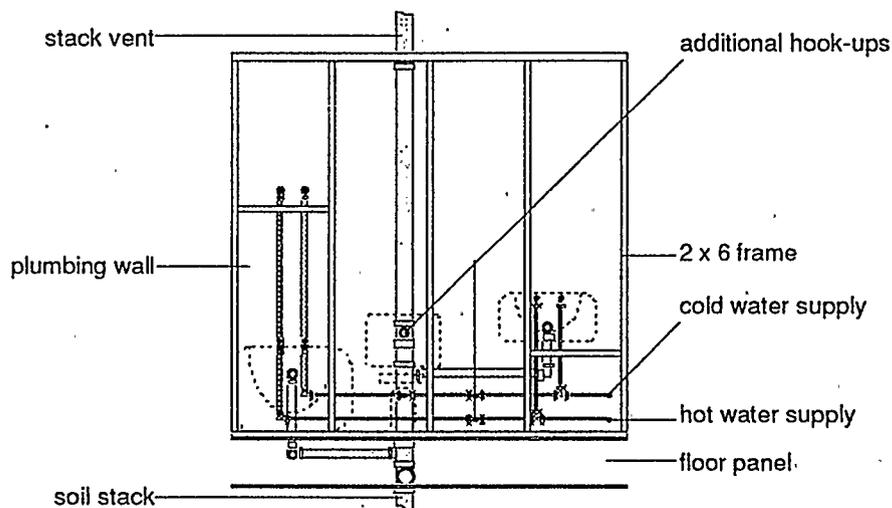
Example of a plumbing wall showing hot and cold water supply, and drainage piping
